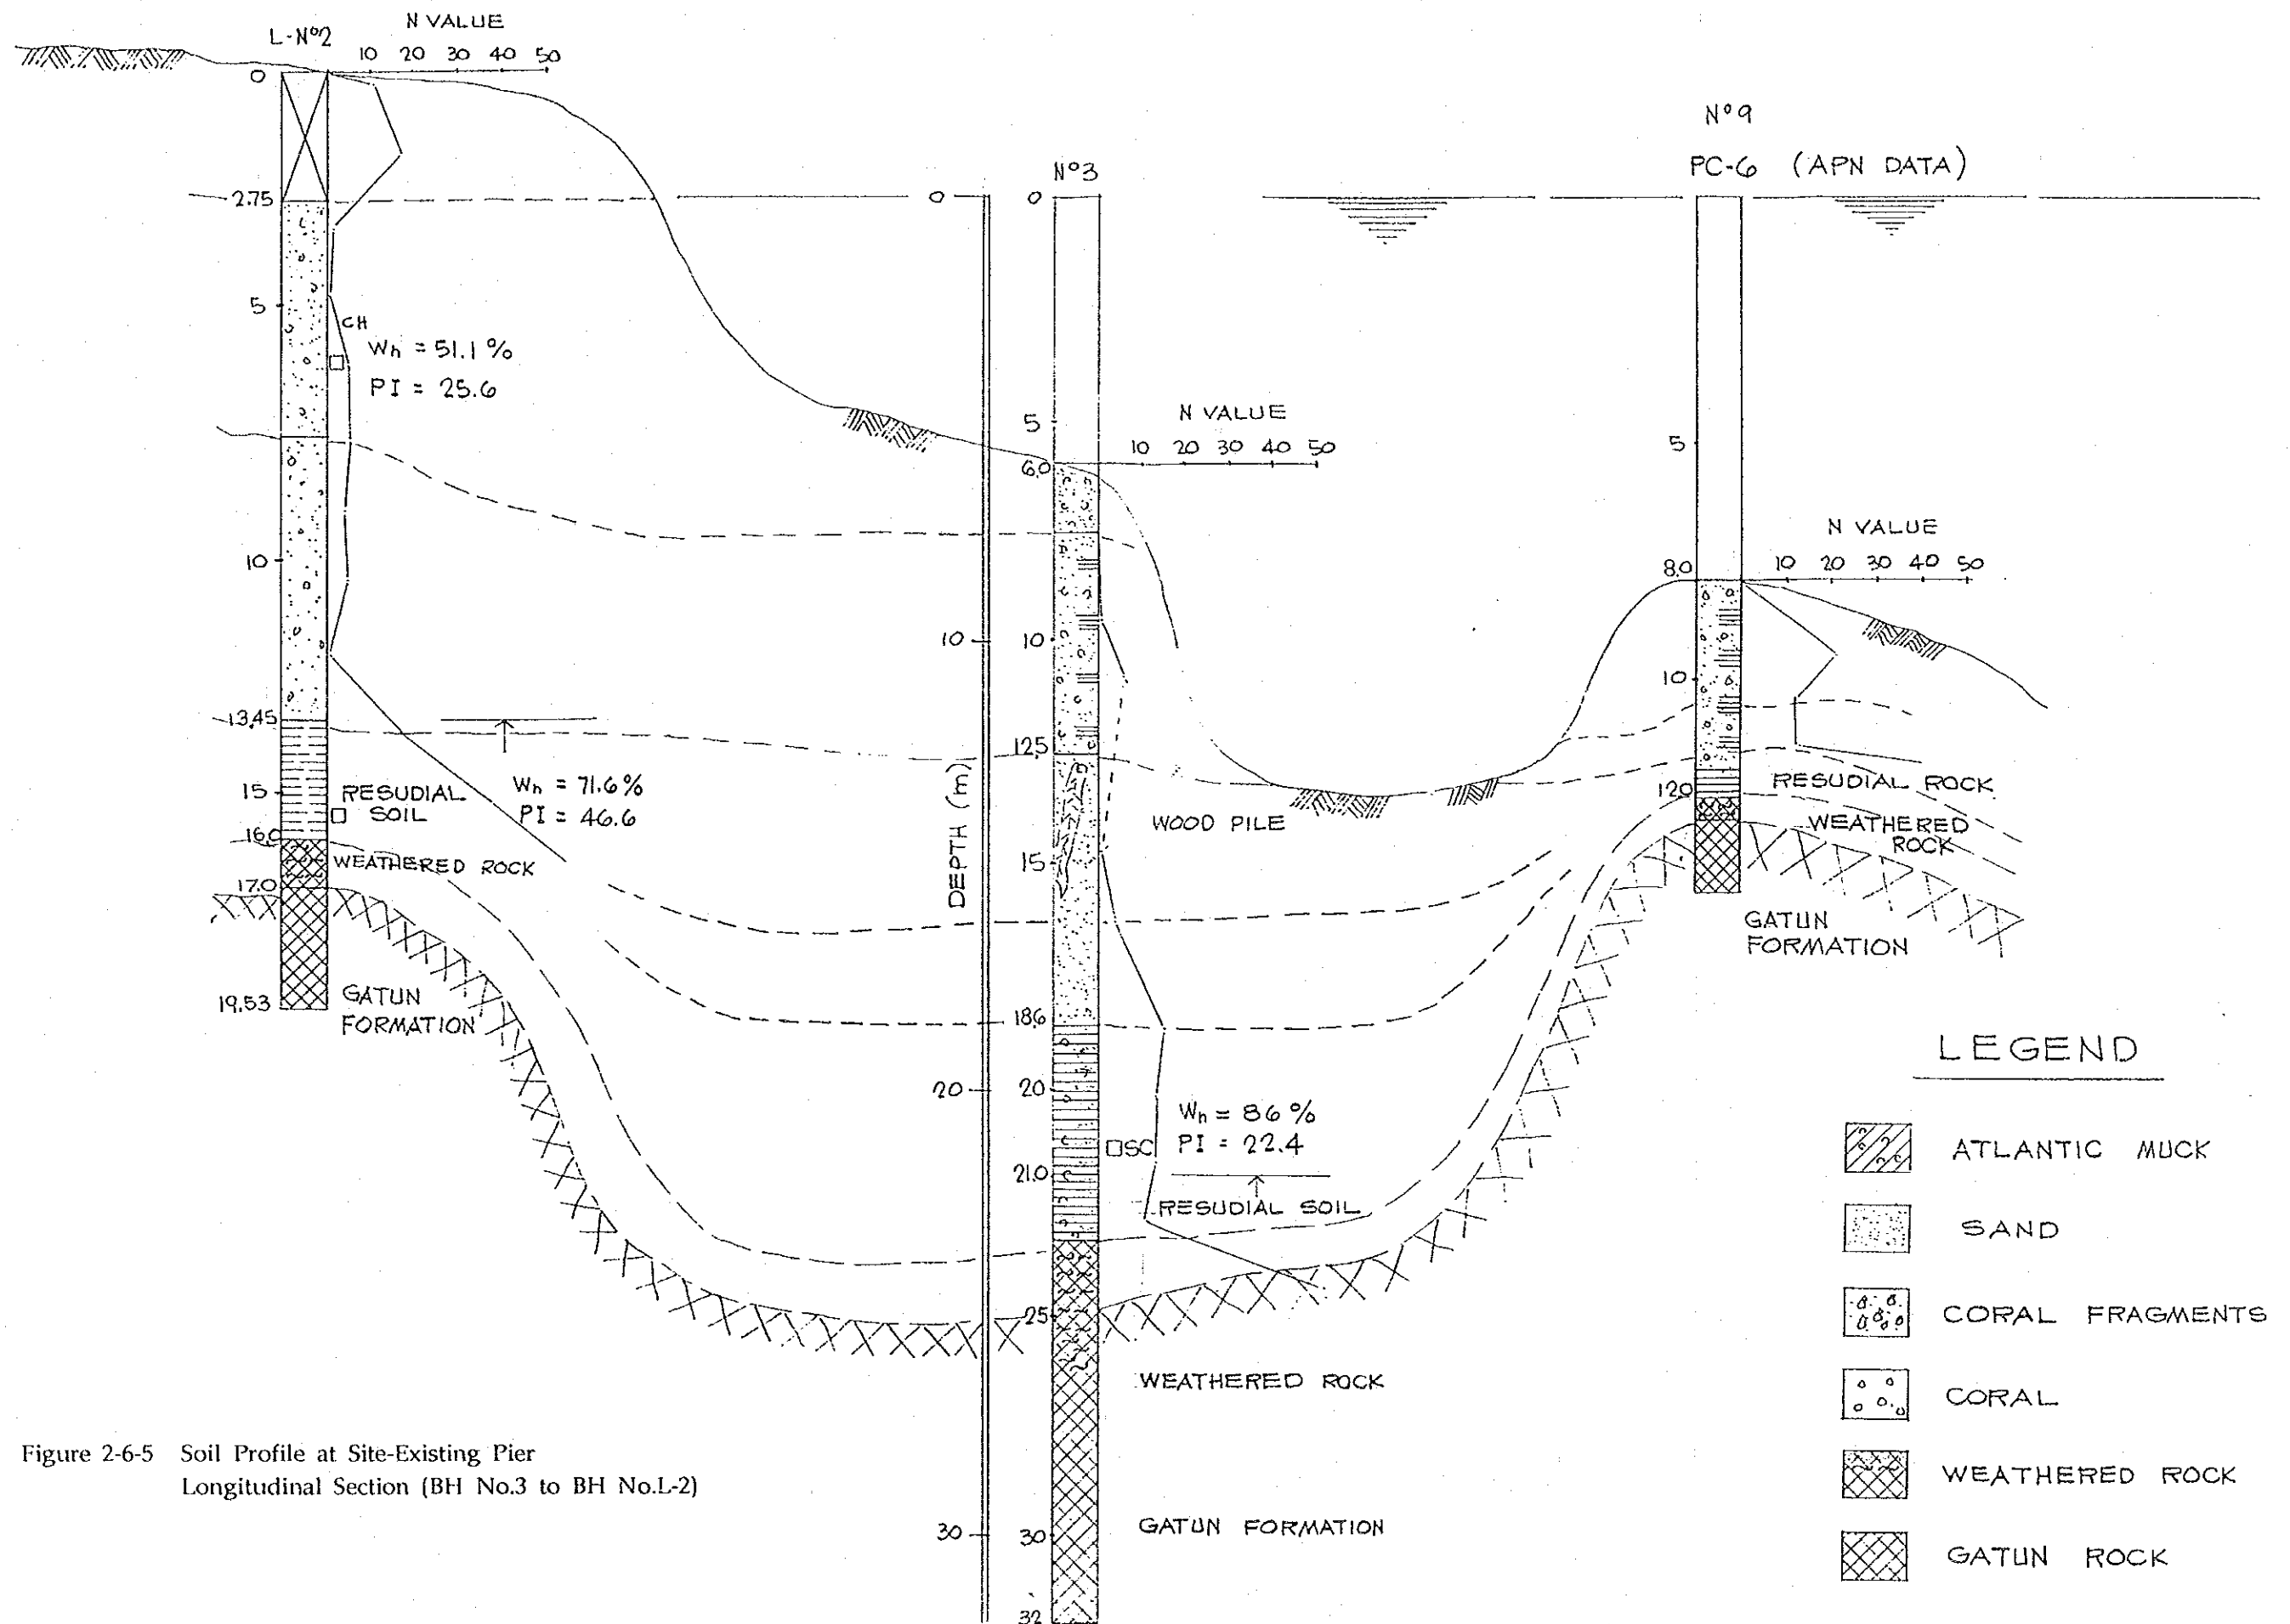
Soil Profile at Site-Existing Pier
